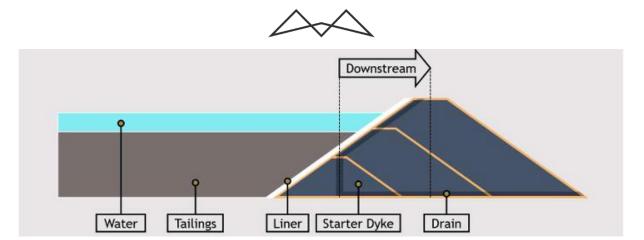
Downstream Tailing Storage Facility design (Yanama Gold, 2023)
